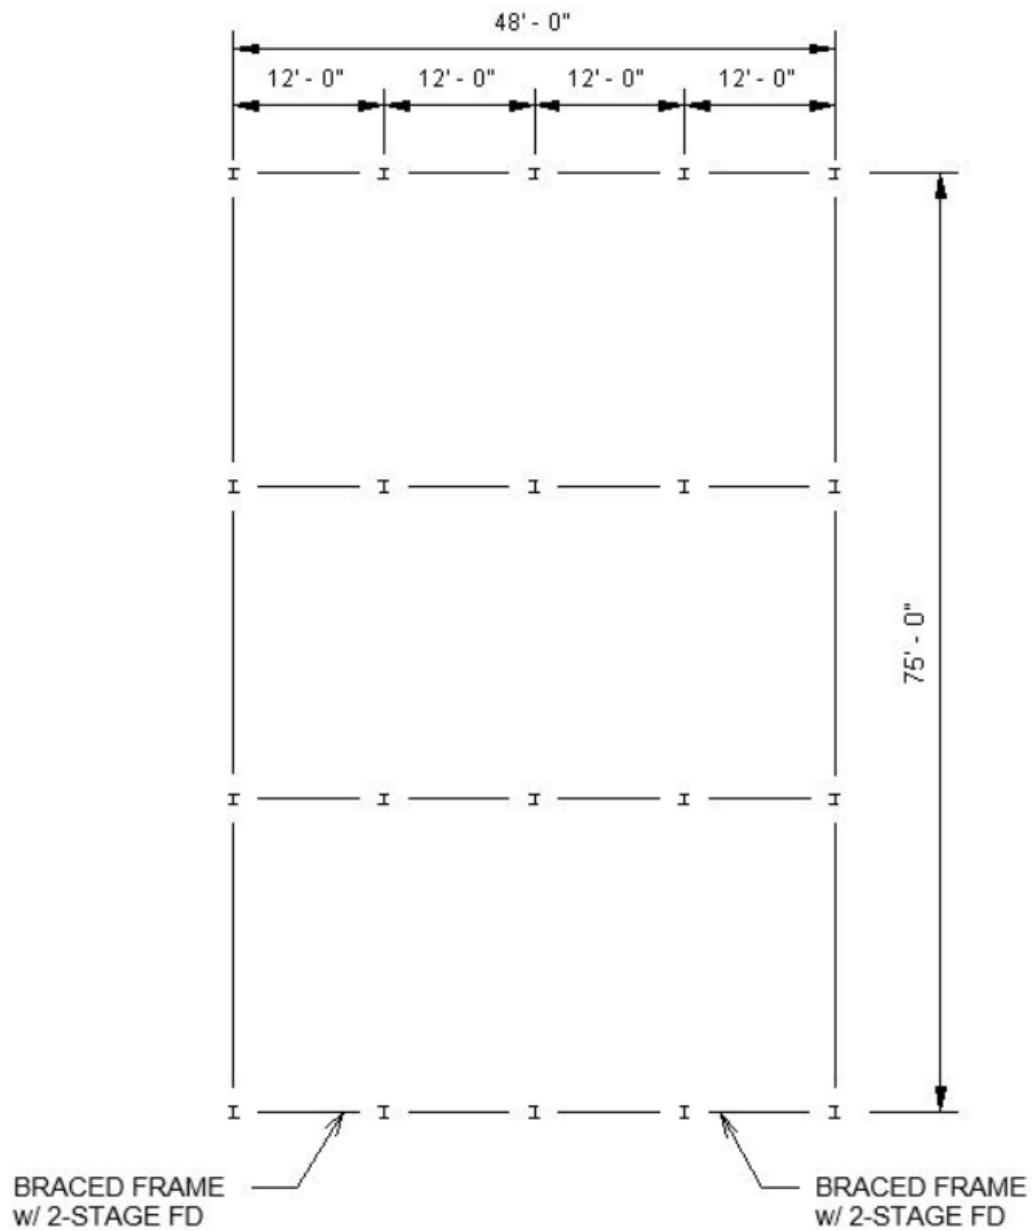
4-Story, 4-Bay Friction Damper Model Plan View.
